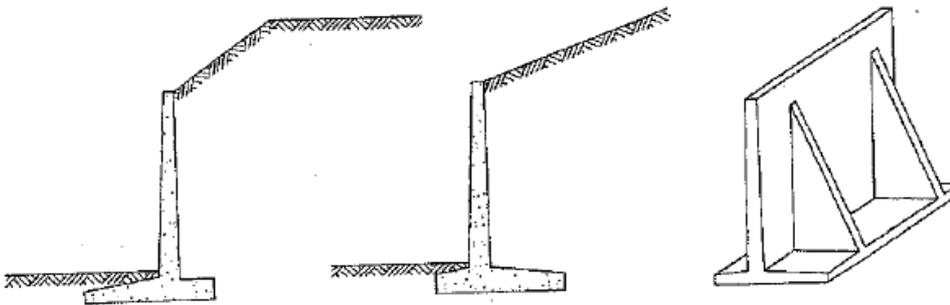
cantilever reinforced concrete wall and counterfort wall (9)
